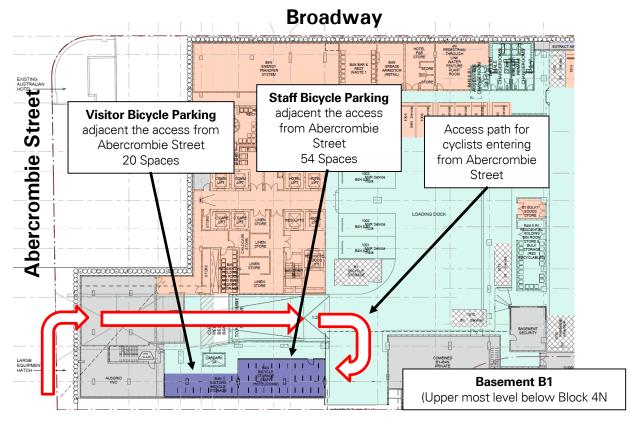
Location and Access path to staff bicycle parking Basement B1 Source: PTW + JBA
